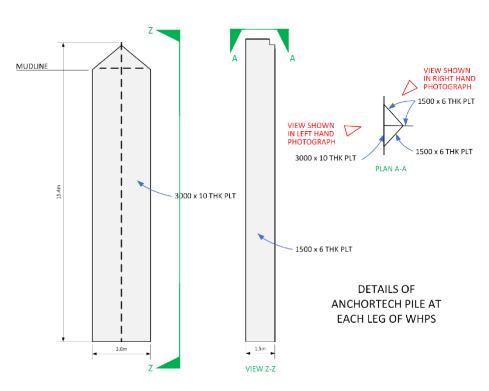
Well P1 WHPS 'Anchortech' piles (4x)
